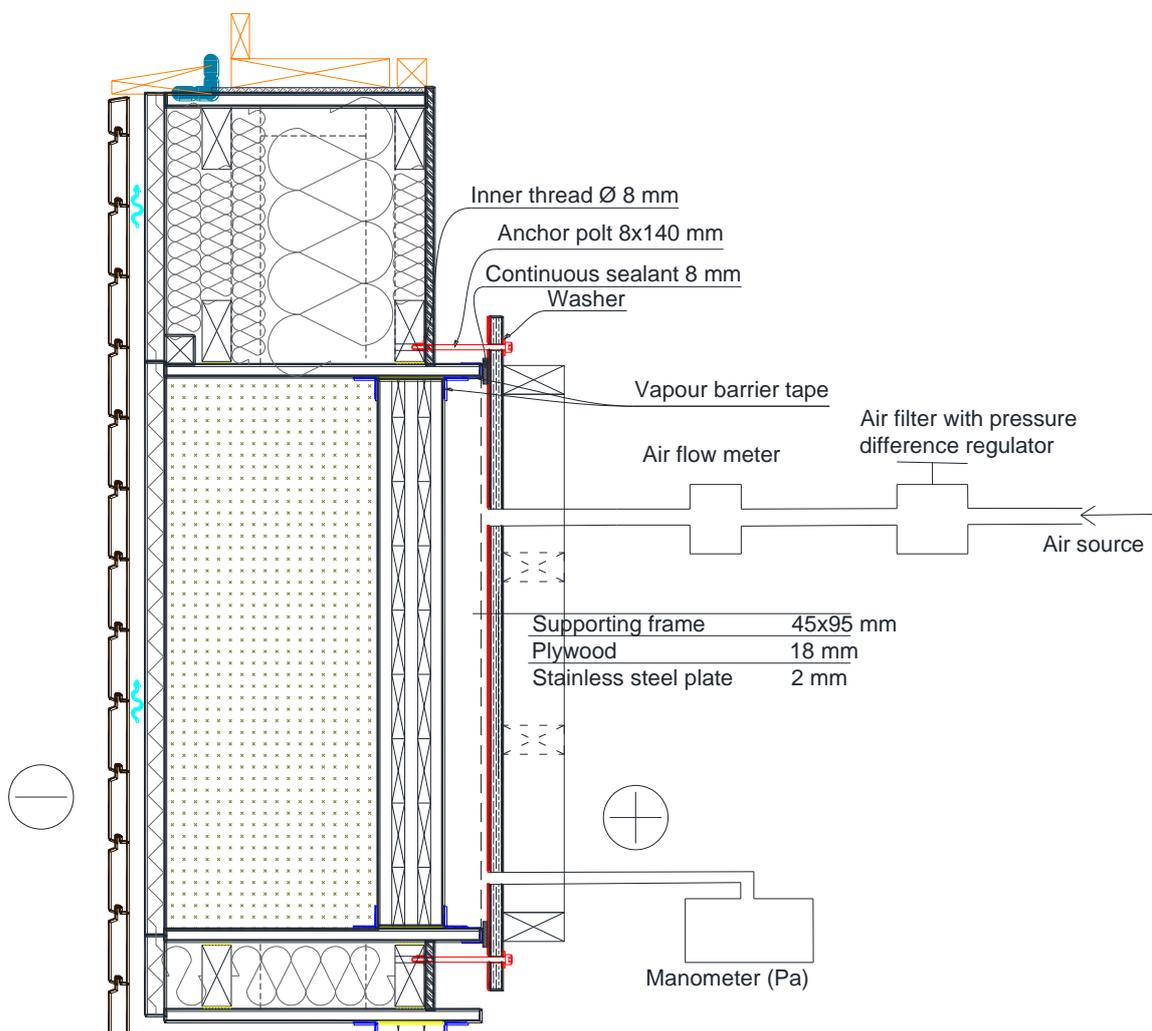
A sectional scheme of the apparatus to be used for the air permeability test (Technical drawing by Villu Kukk adjusted by the author).
